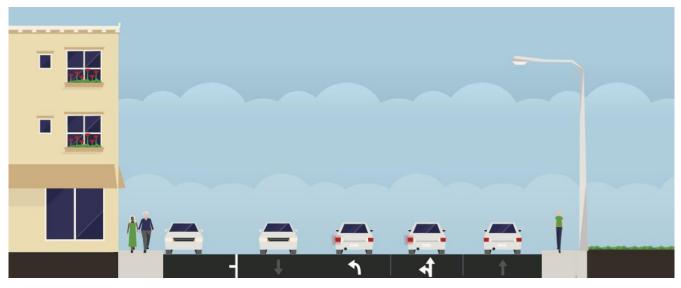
87 Avenue Facing East (West of 109 Street)
